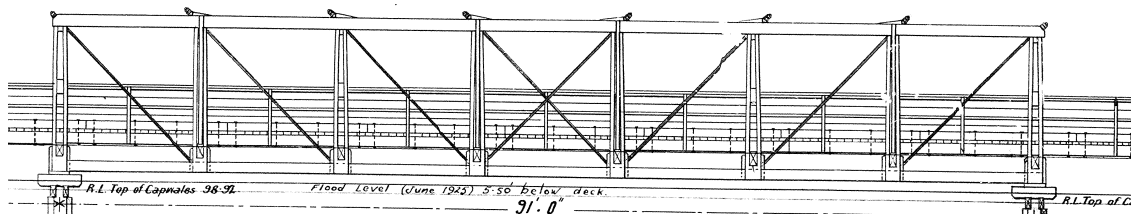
de Burgh Truss: Lansdowne Bridge over Mulwree Ponds near Goulburn (typical)
